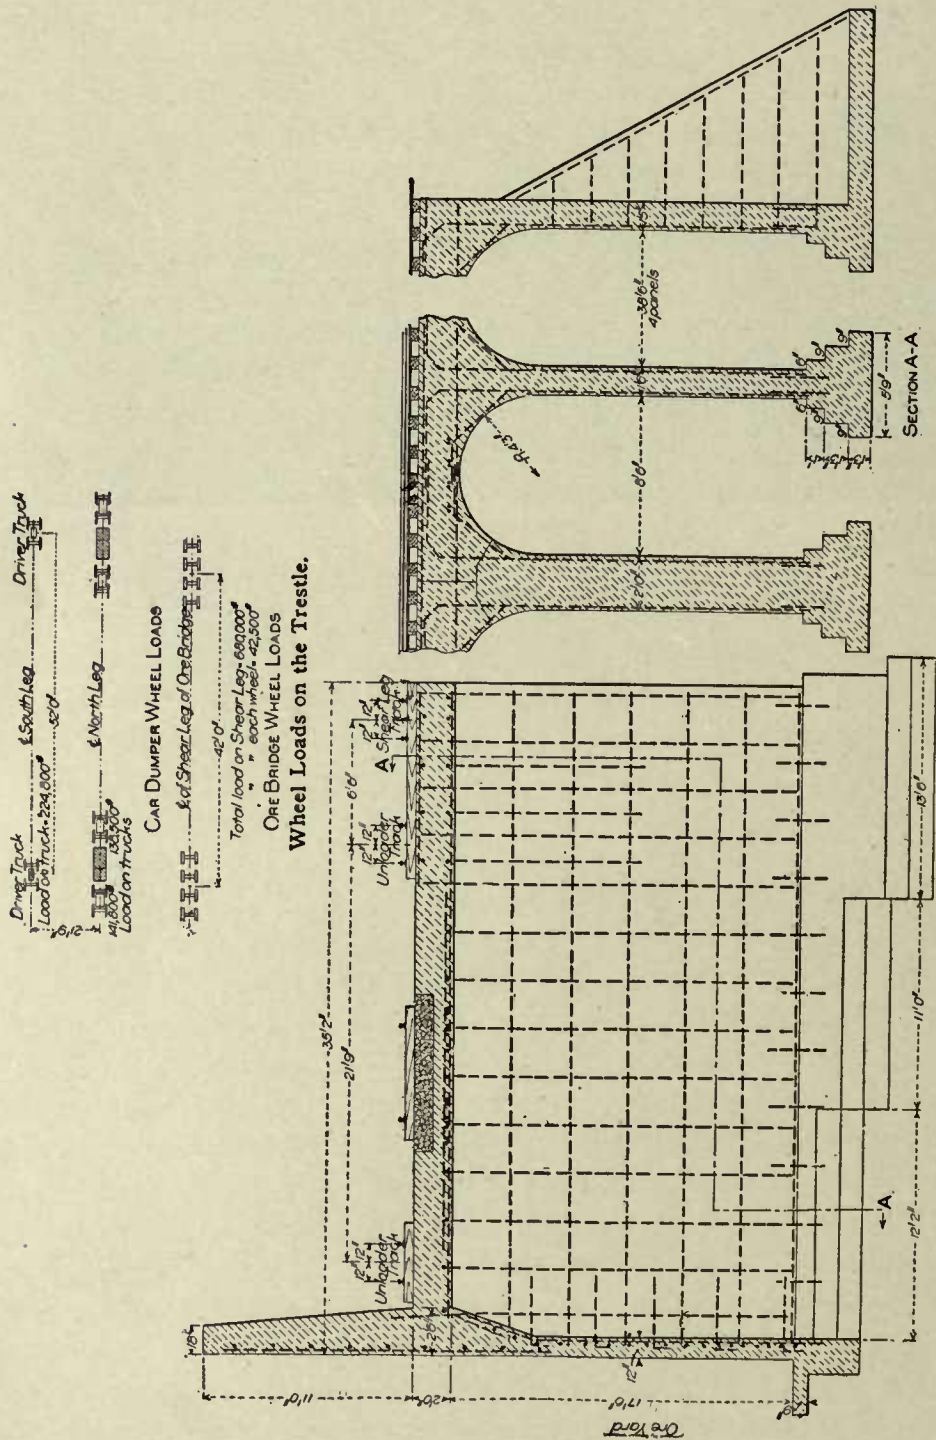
PLATE LXXIII.—REINFORCED CONCRETE TRESTLE, YOUNGSTOWN SHEET AND TUBE COMPANY.
